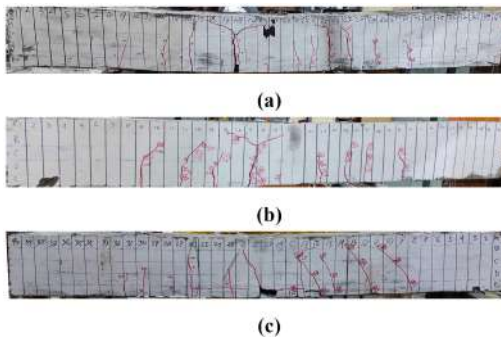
Crack patterns of HVFA-SCC splice beams with specified splice lengths: (a) 0.75-12-NS, 12 mm rebar; (b) 0.75-16-NS, 16 mm rebar; (c) 0.75-19-NS, 19 mm rebar, all with $0.75l_s$.
